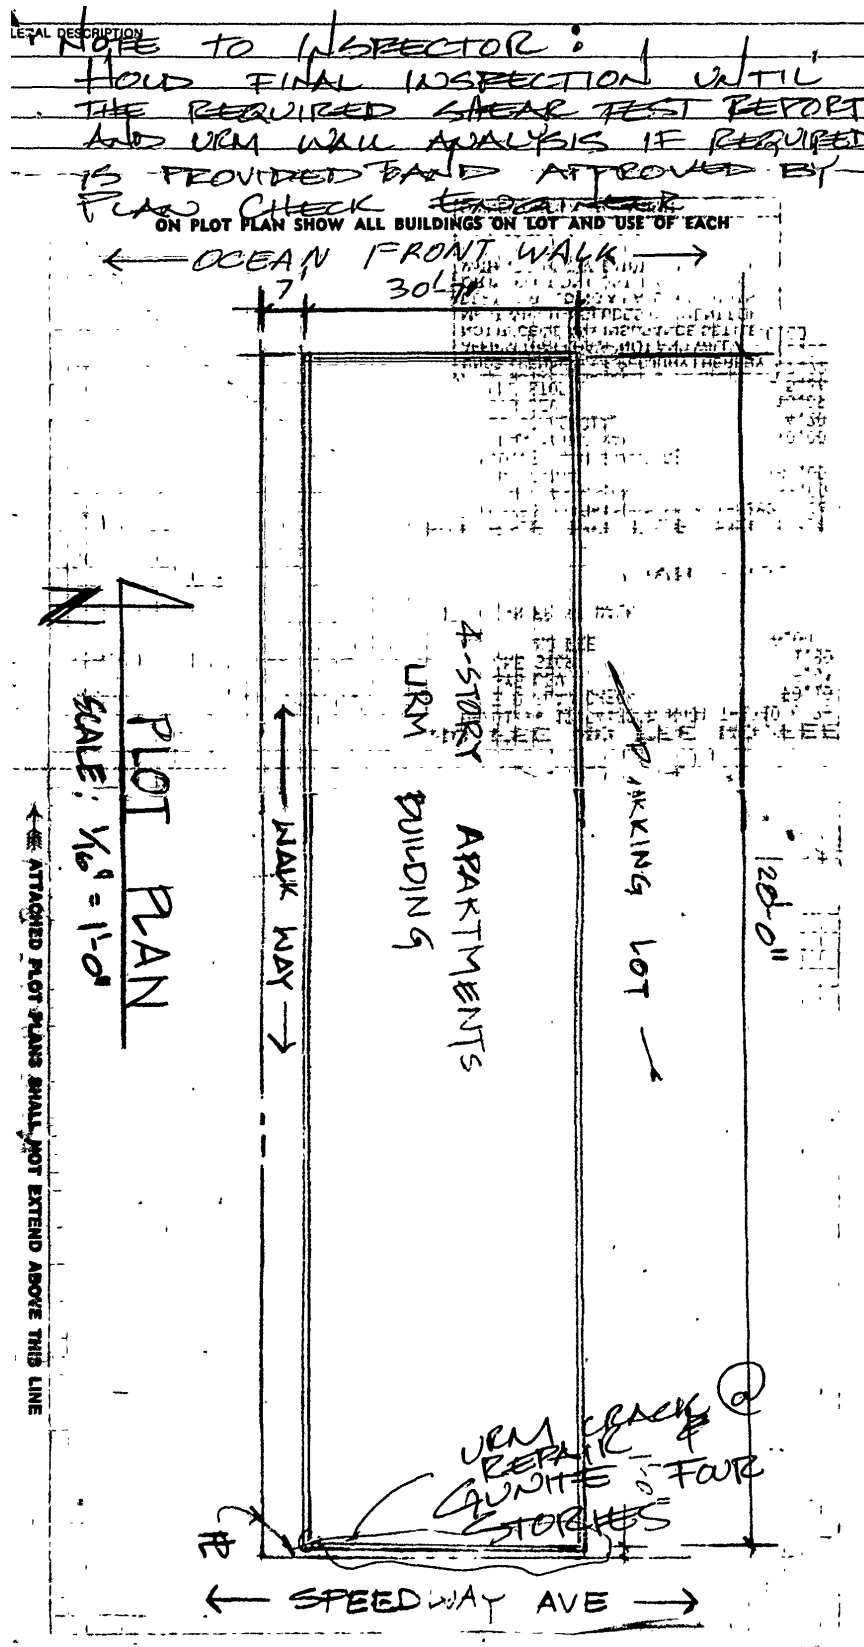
1995 permit for earthquake damage repair, unreinforced masonry crack repair, gunite to east elevation (four stories) (page 4 of 5)
